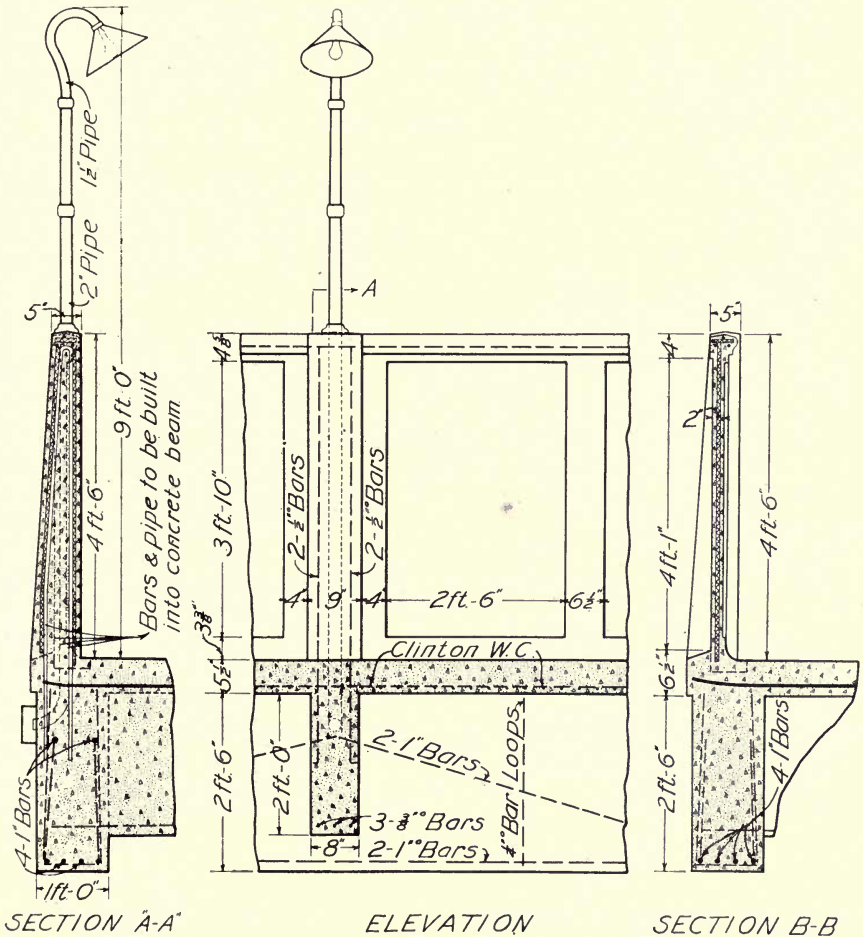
DETAILS OF CONSTRUCTION, PLATFORM FENCE, B. R. T. CO.
